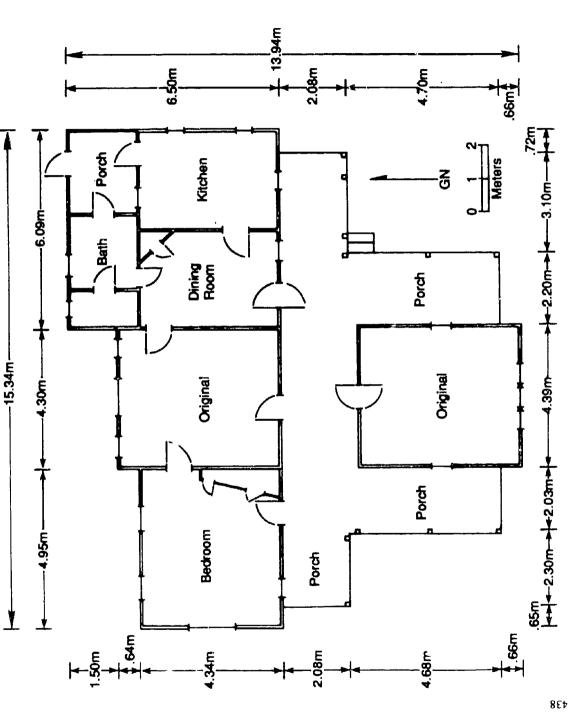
Architectural floorplan of the ca. 1909 dwelling at 41DN224.
